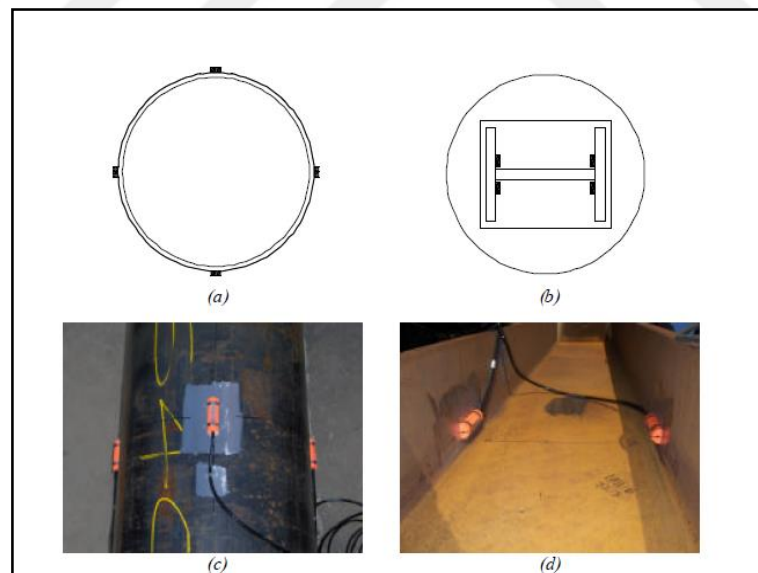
Typical strain gauge locations a and c a tubular, and b and d a welded channel section (Zaremba, 2007)
